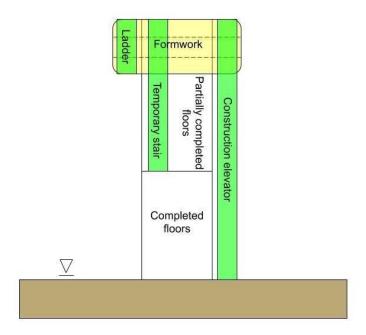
General plan for high-rise construction (Adapted from Galea et al. (2019))
